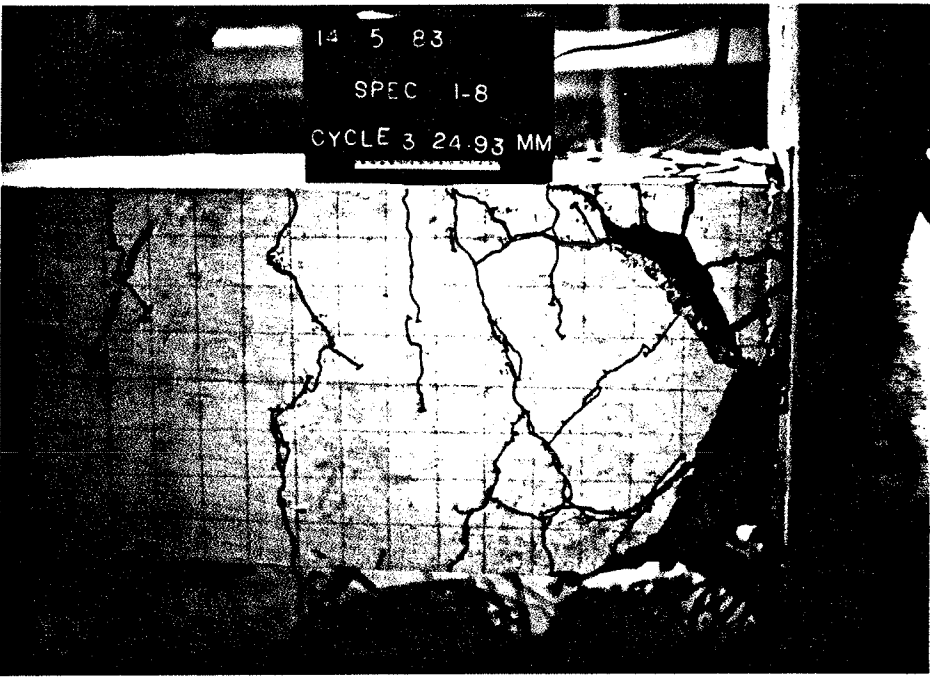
FINAL CRACK PATTERN FOR SPECIMEN 1-8 AT 9δy/3
